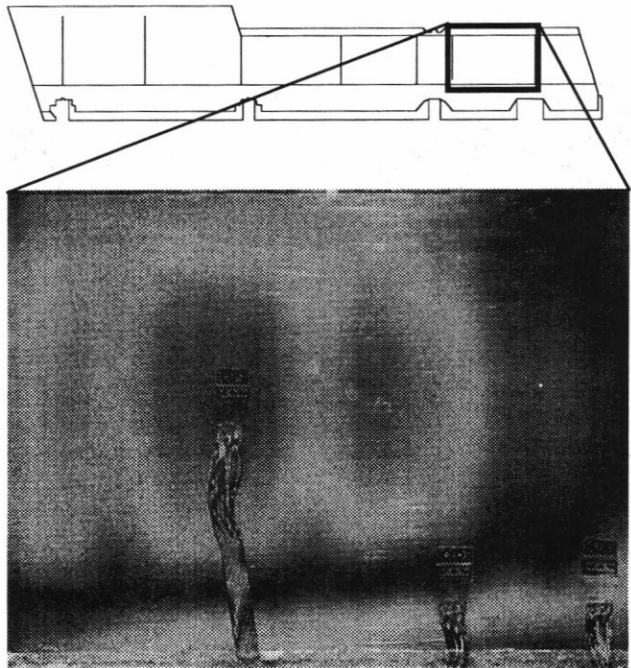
Moiré Fringe Pattern at Inboard End
